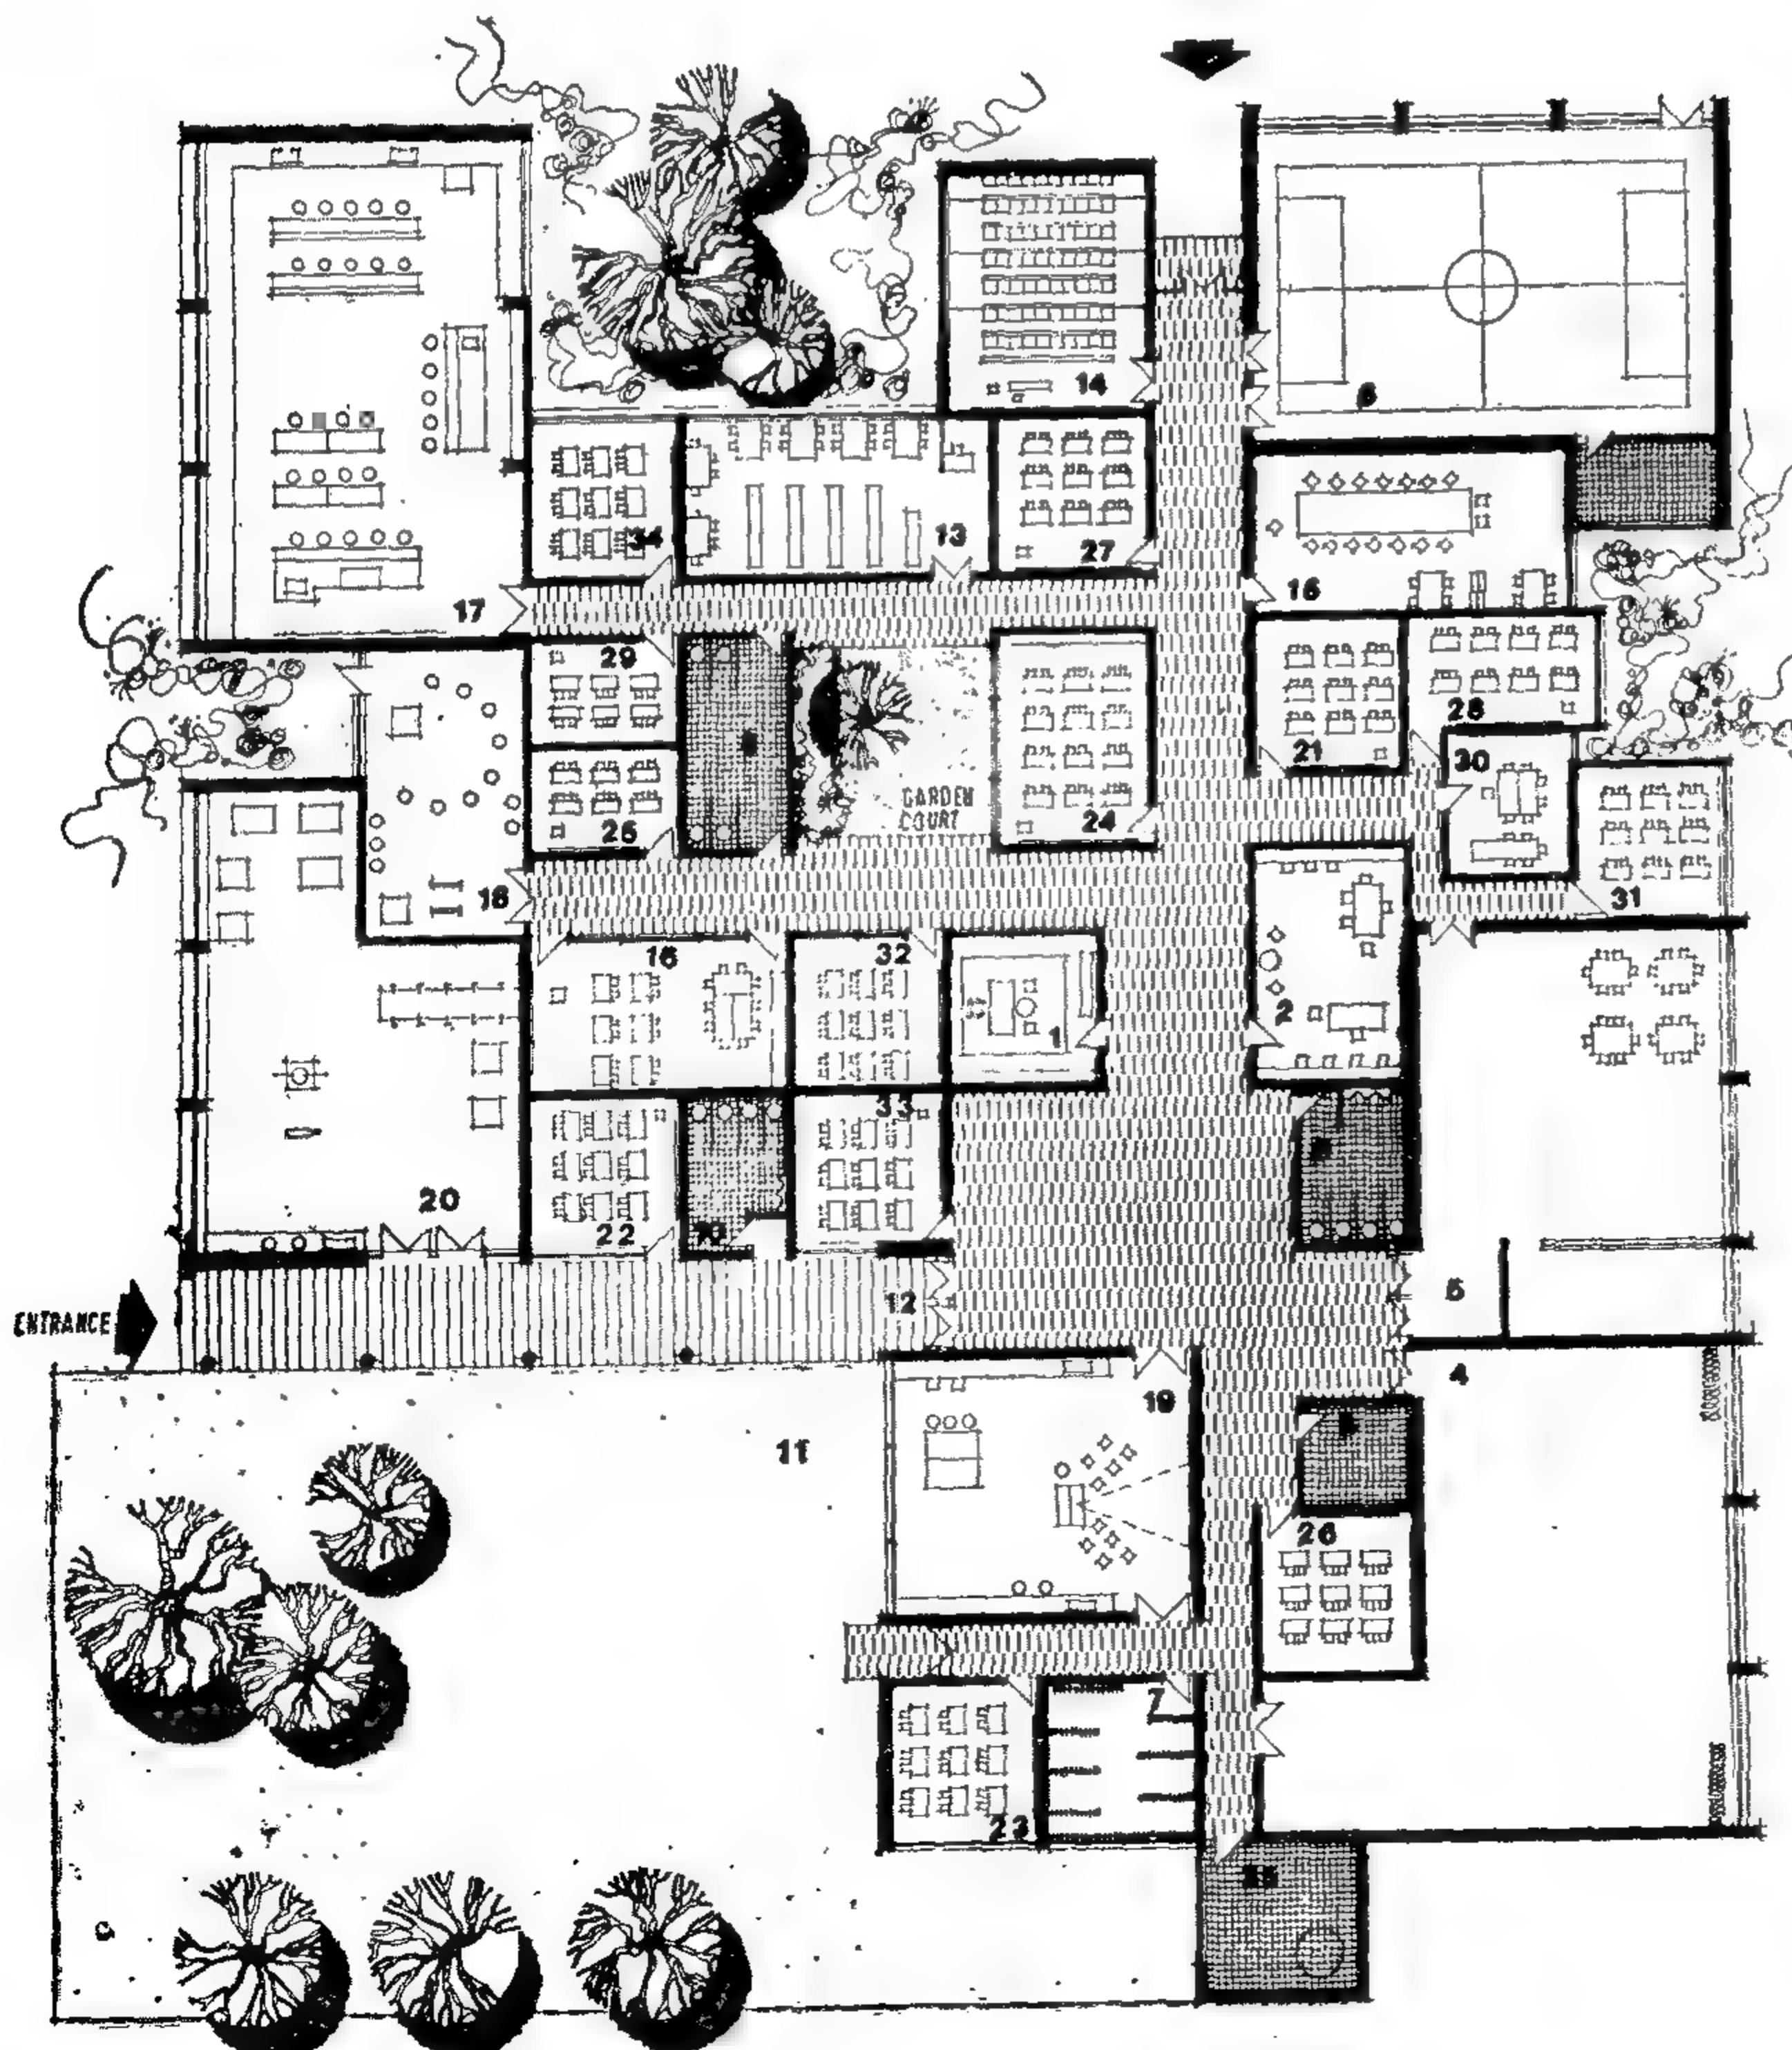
Possible practical plan of secondary modern school developed from diagrammatic layout Fig. 11.
